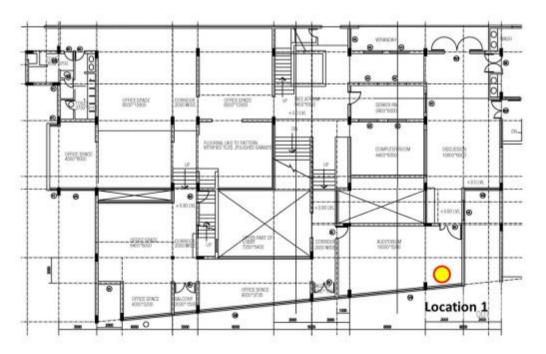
Floor plan showing monitored location- Building 3 in Bangalore
